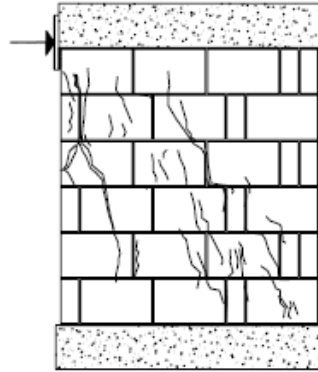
Crack pattern at failure for the unstrengthened wall (Marcari, 2007).
